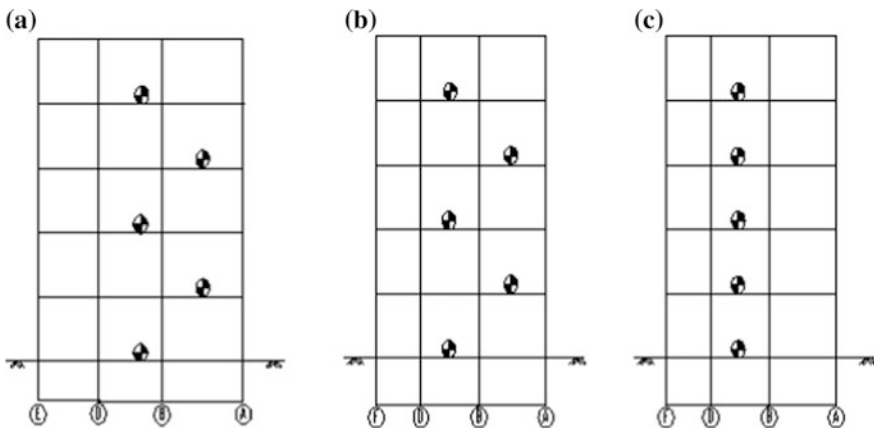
Layout of measuring points on buildings: a in Building 1, b plan 1 for Building 2, c plan 2 for Building 2
